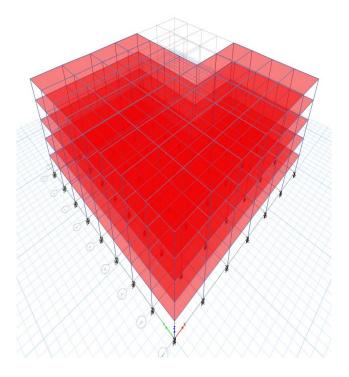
Three Dimensional view of G+4 RCC Frame Building Using FREI
